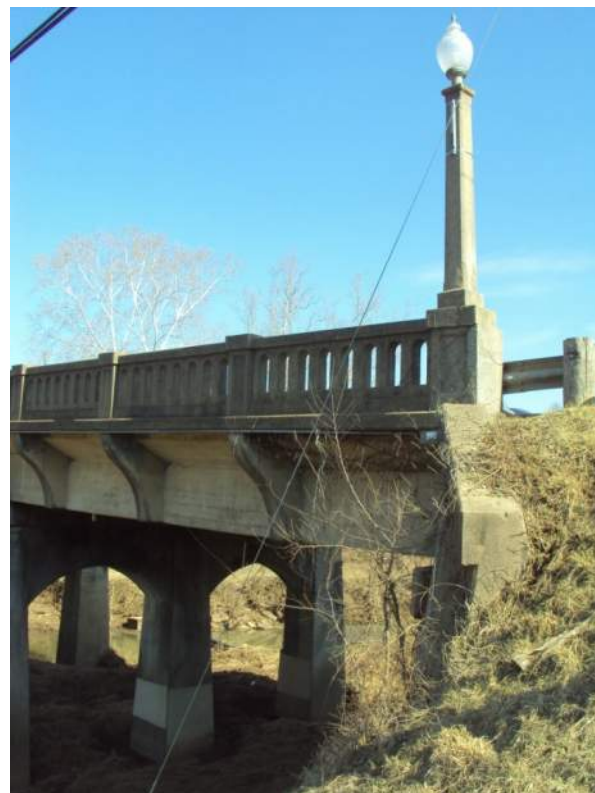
Existing typical lighting on Ruby Bradley Bridge.
